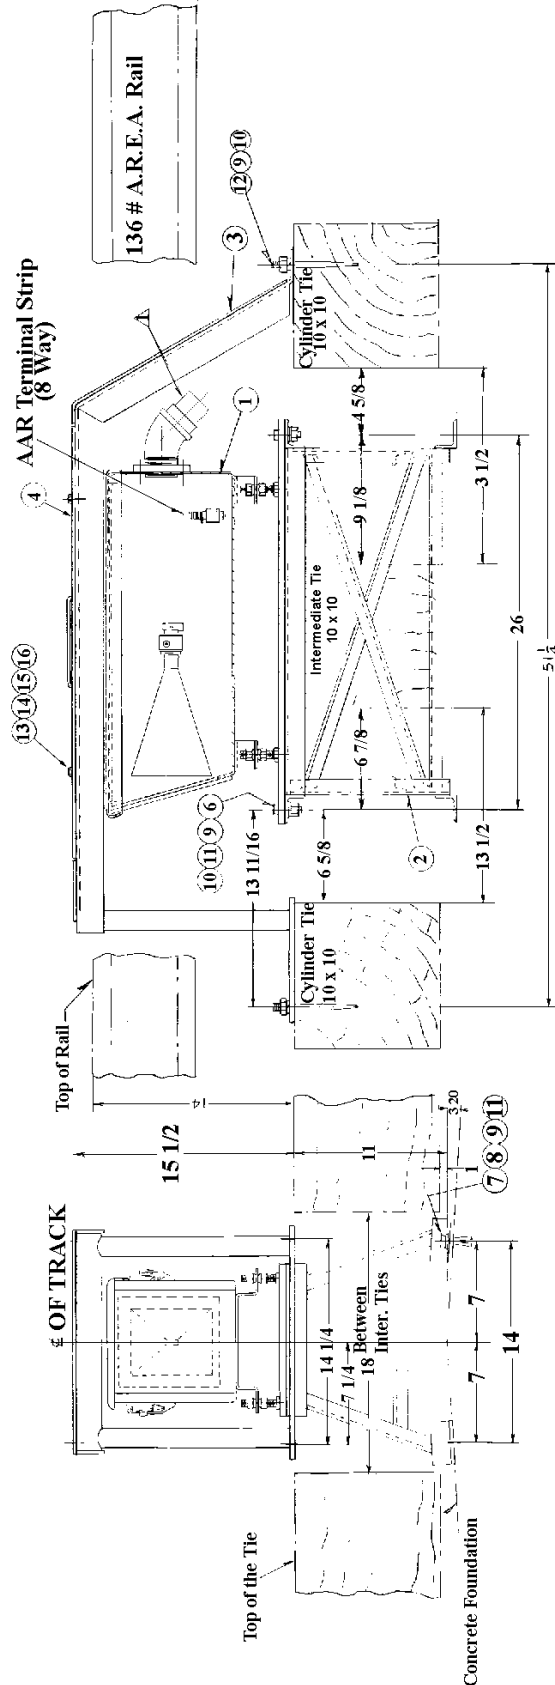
DR-50 Radar, Application Between Rails, Concrete Foundation
